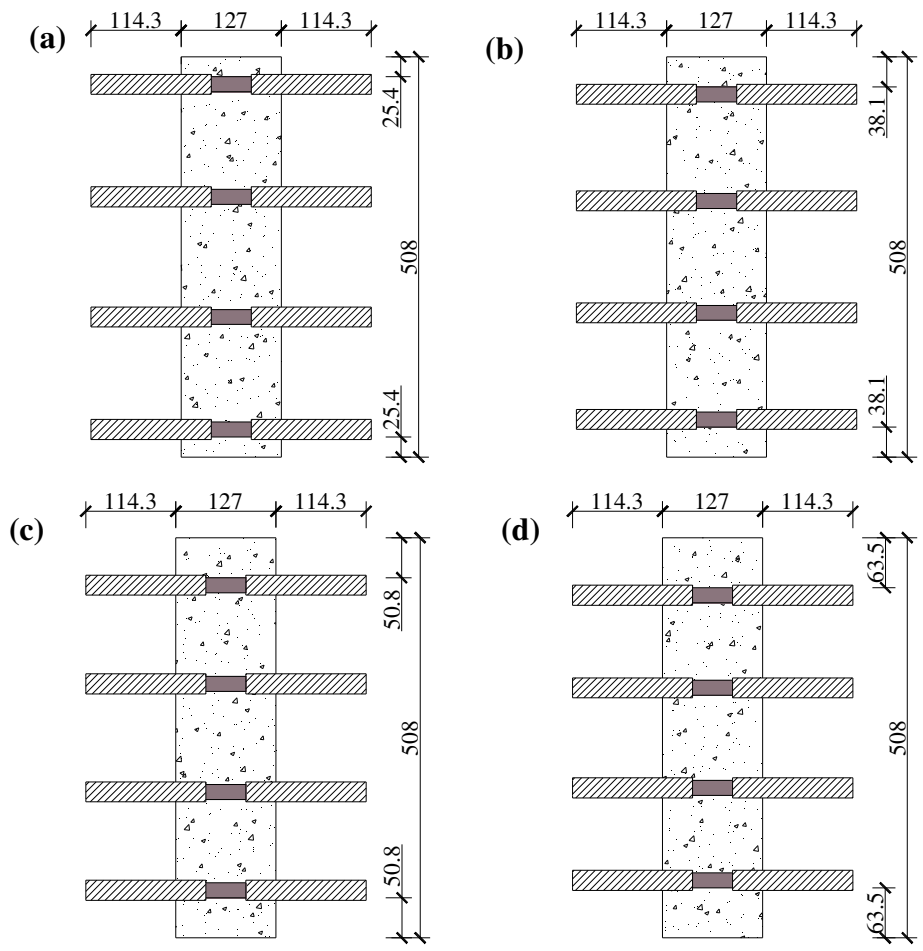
Side views of small concrete blocks with four concrete cover thicknesses: (a) 25.4 mm, (b) 38.1 mm, (c) 50.8 mm, and (d) 63.5mm (unit: mm).
